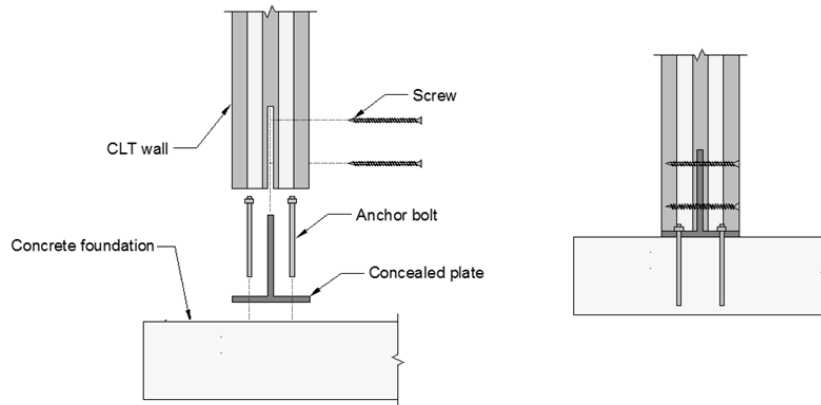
Concealed plate connection between foundation and CLT wall.
